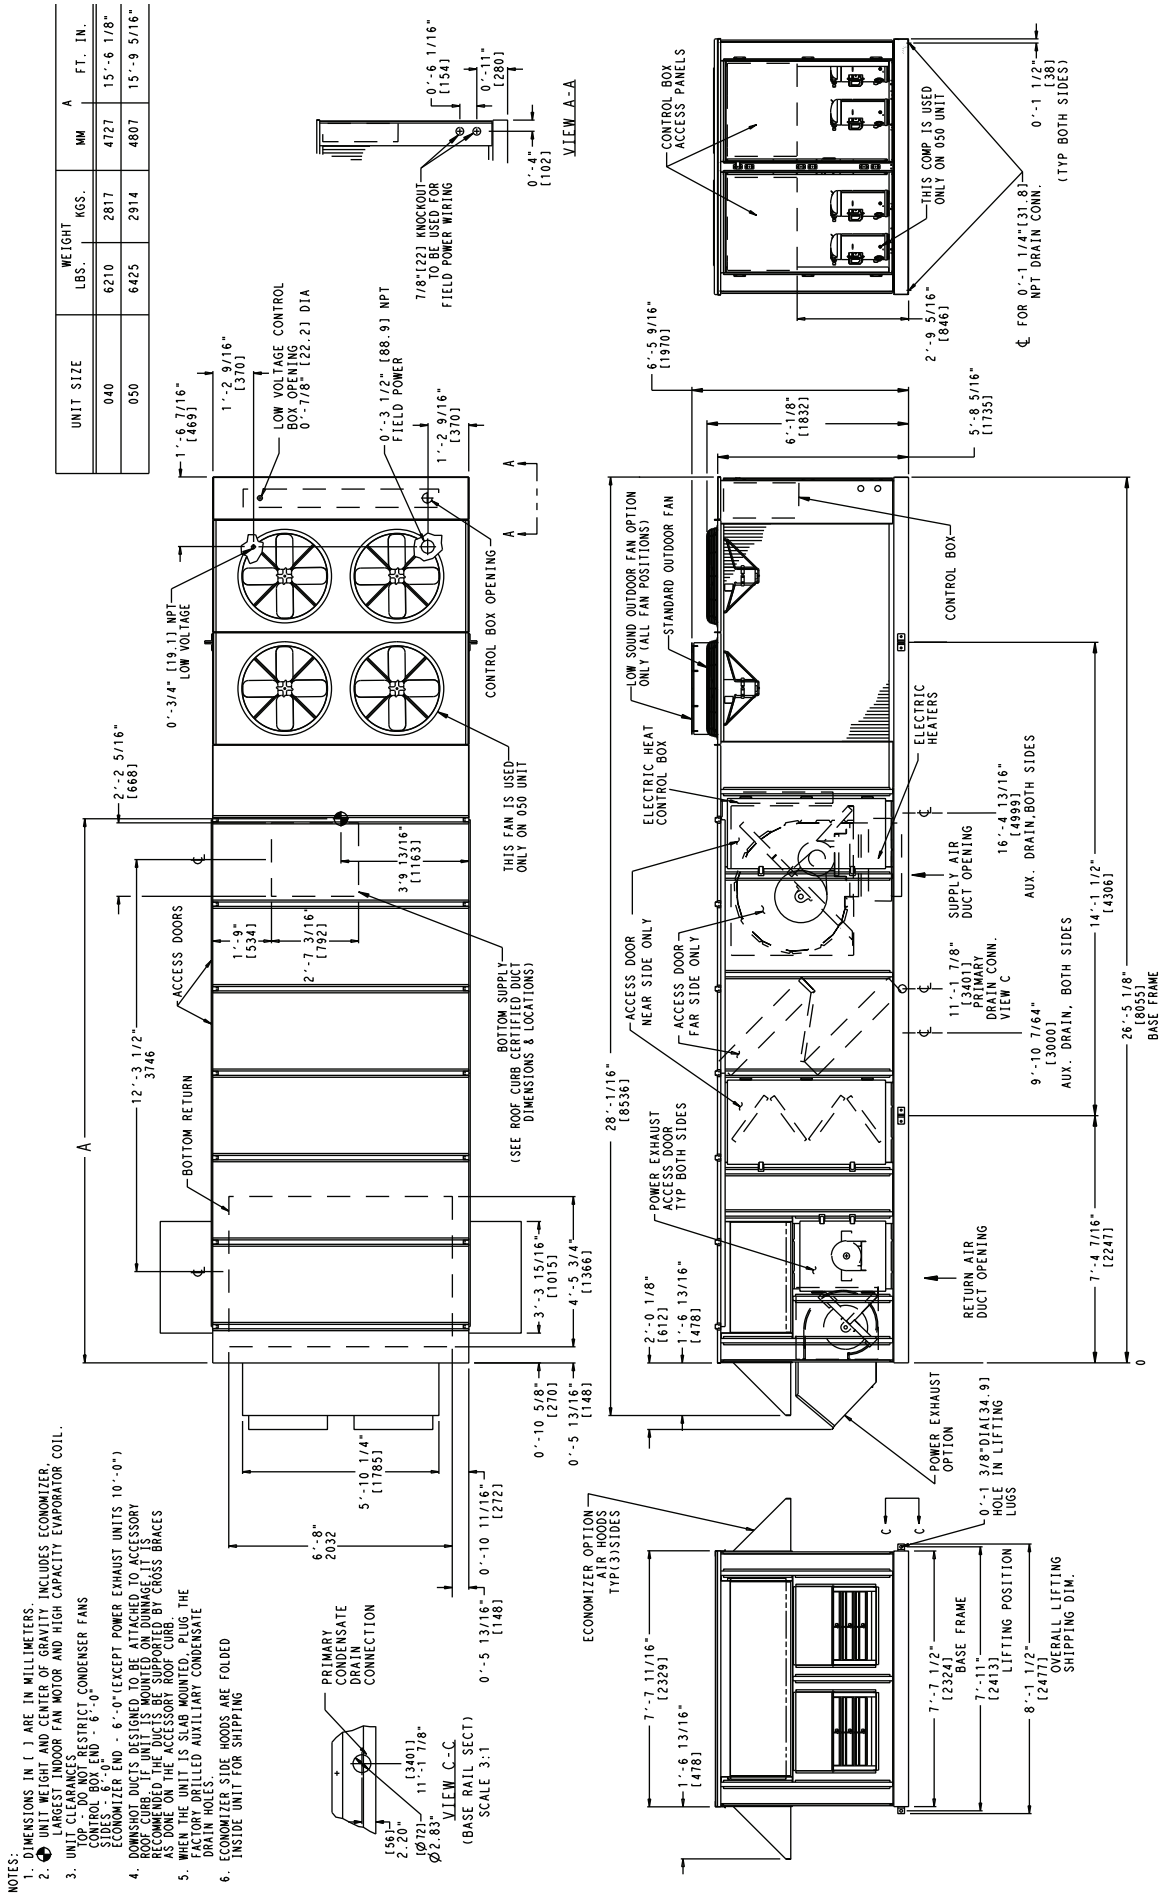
Base Unit Dimensional Drawing — 50P2, P3040-050 (Standard Chassis Unit Shown)
